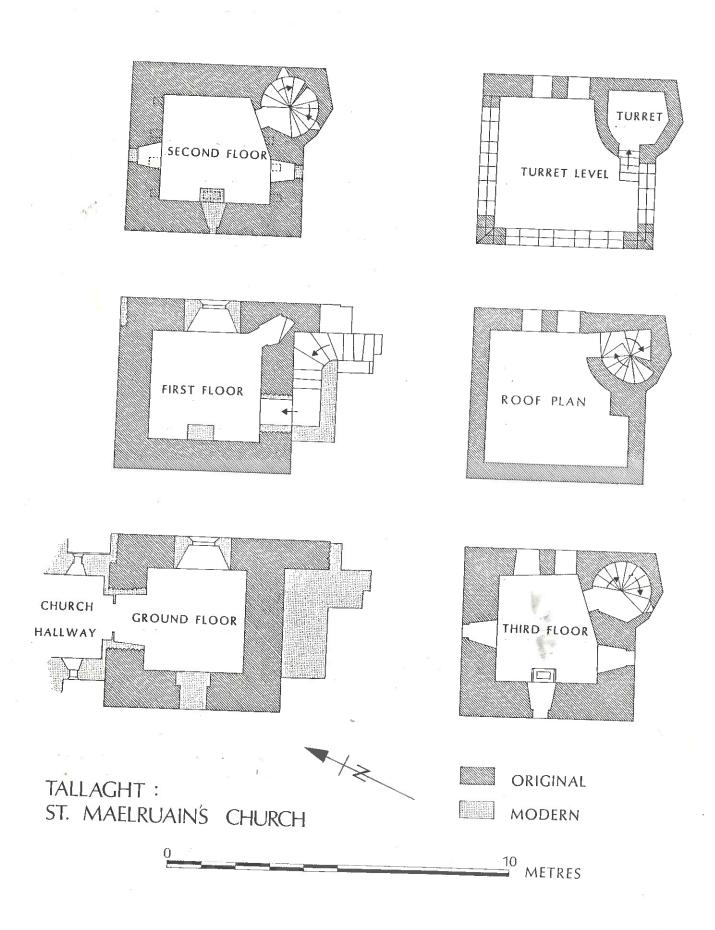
Floor plans of St Mael Ruain's Church, Tallaght.
